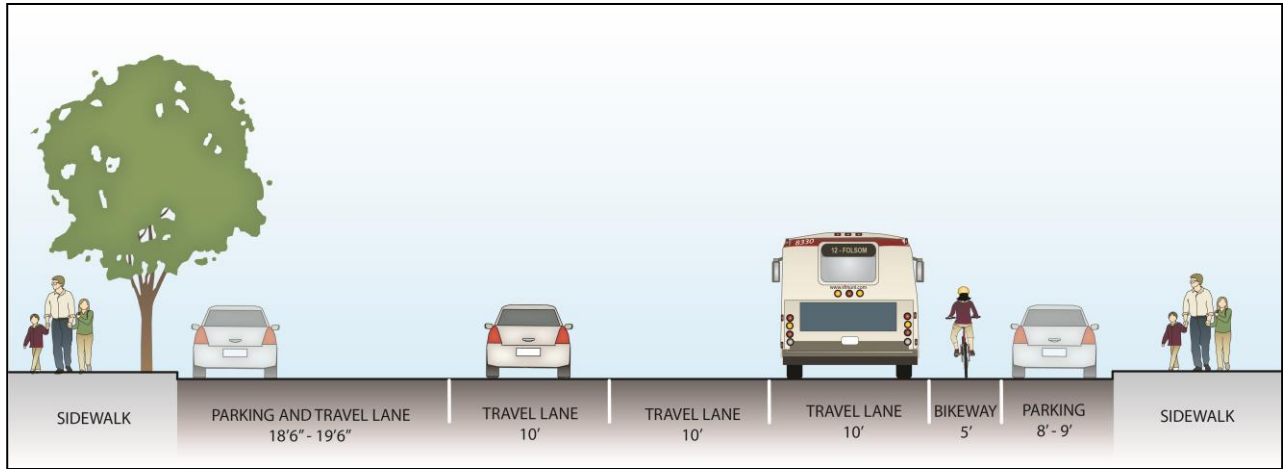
Existing, Folsom Street from 11th Street to 4th Street
